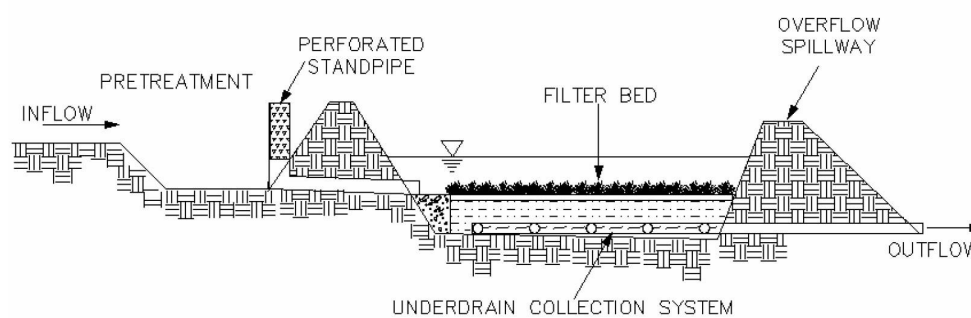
TYPICAL SECTION THROUGH BIORETENTION SYSTEM
